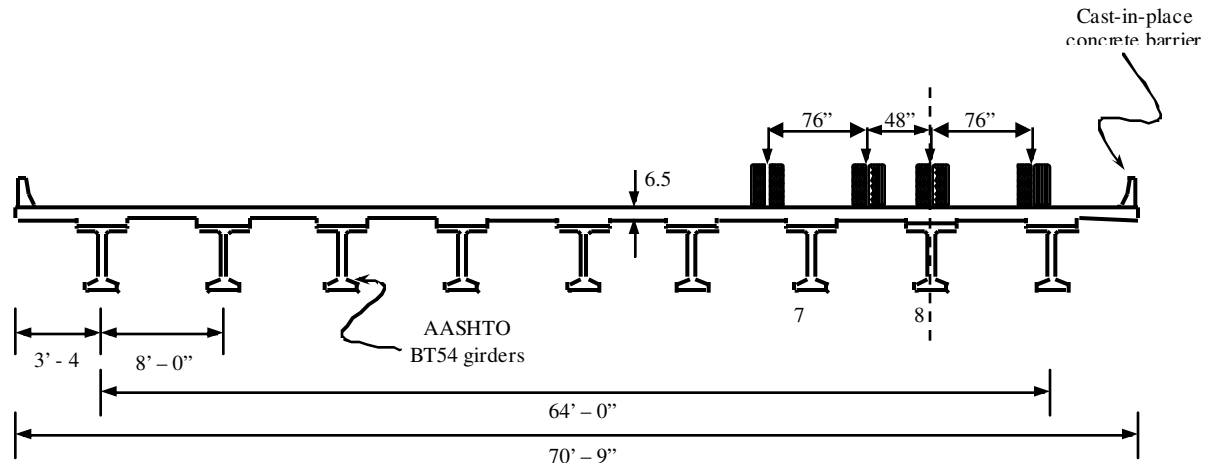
Lane C – Horizontal Truck Positioning (Static and AE Test)
